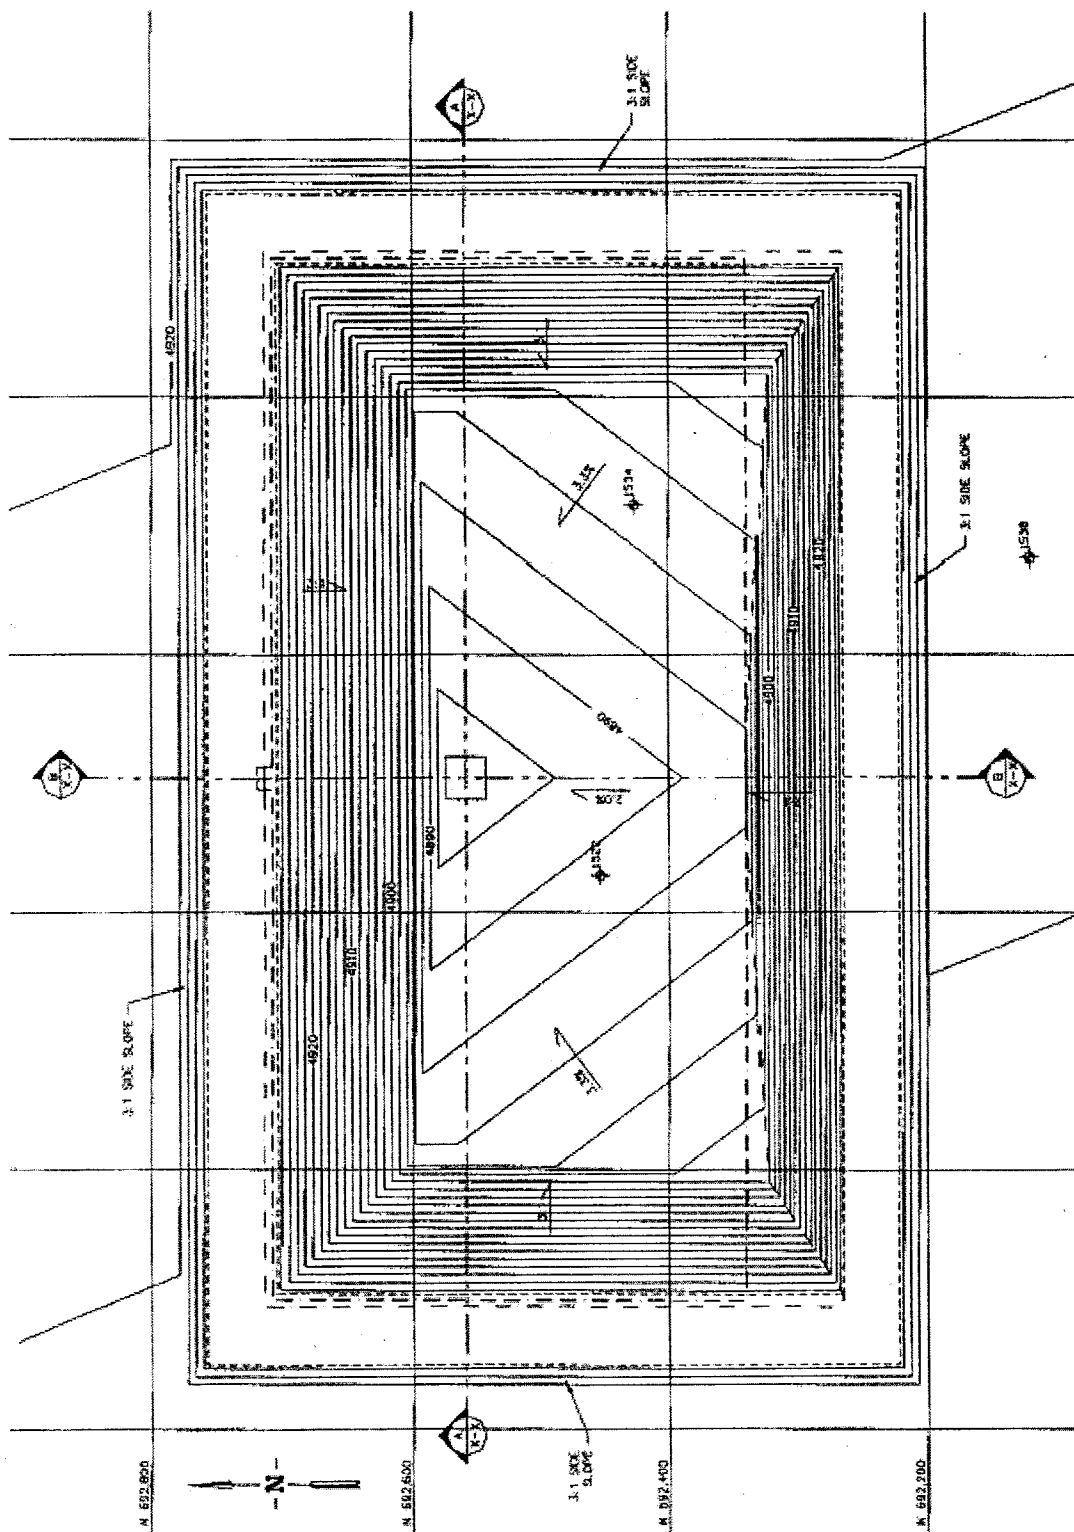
Completed ICDF (Cell 1) landfill plan.
